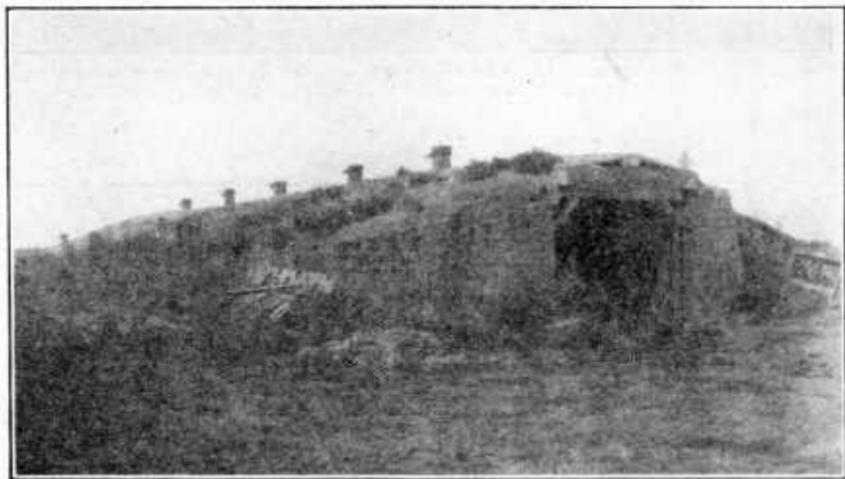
A potato-storage house with walls of sod, adapted only to dry sections
